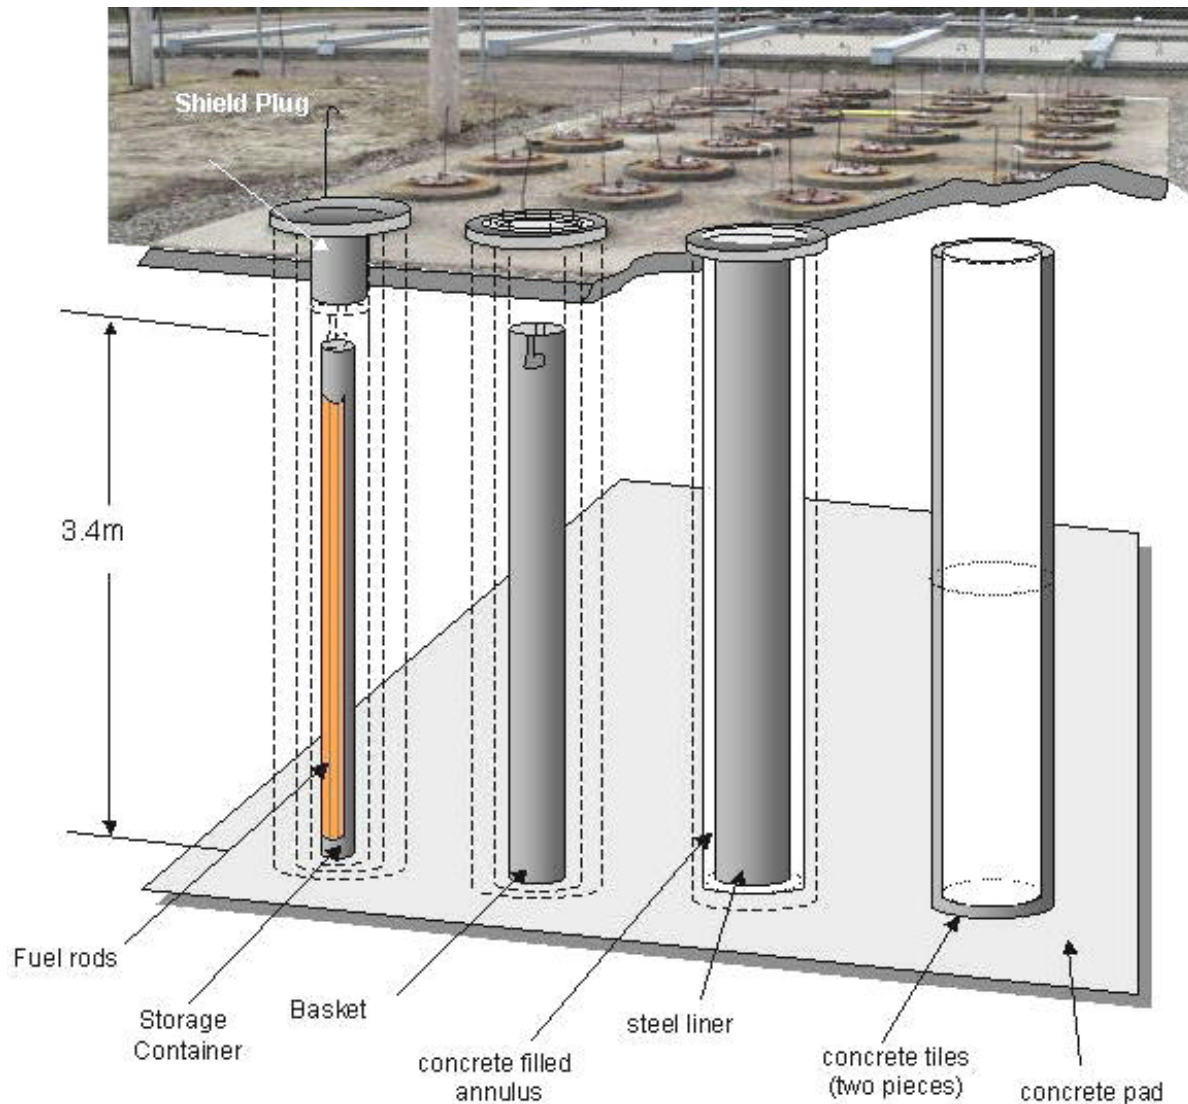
Tile Hole Construction. Tile Holes are constructed in arrays, on a concrete pad foundation, 4.6 m deep. Two concrete tiles are stacked vertically, and sealed at the joint. A mild steel liner with closed bottom is inserted, and the annulus backfilled with concrete. The liner tube has a gasket-sealed flange, which is closed by inserting a vented shield plug. The array structure is packed with sand between the tile holes, and capped with a concrete pad. The fuel rods (typically 3.4 m long) are contained in fuel storage containers, typically surrounded by baskets.
